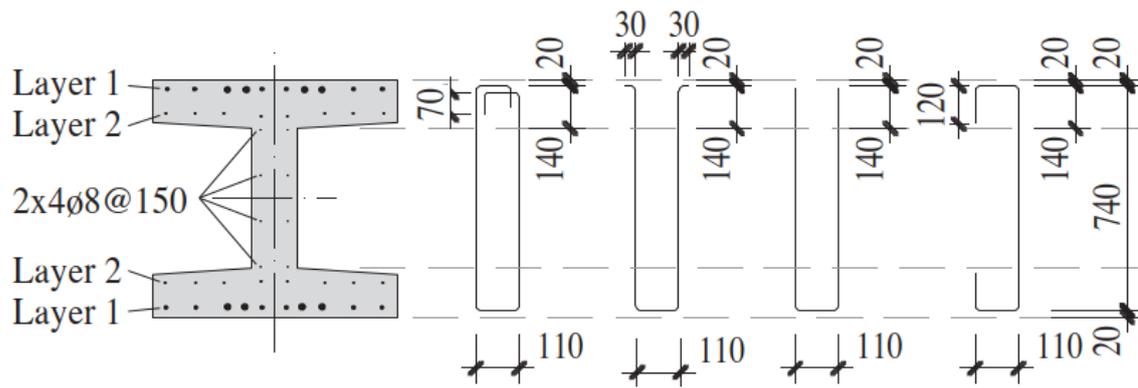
Cross section of I-shaped beams and shape of applied stirrups [9]
